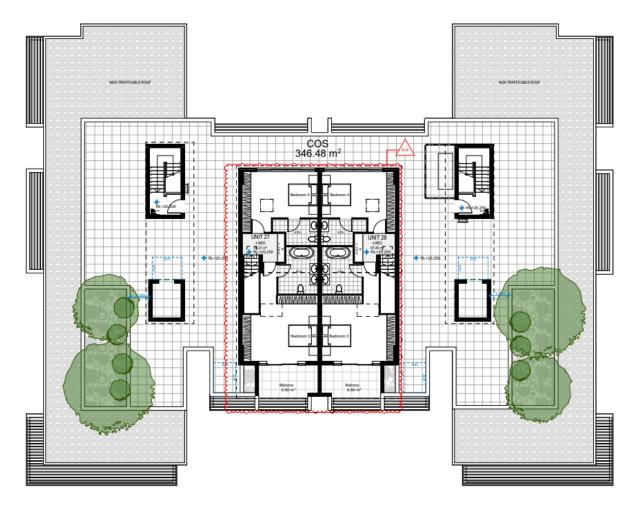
Proposed Level 5 showing floor plan of second storey addition and communal open space
